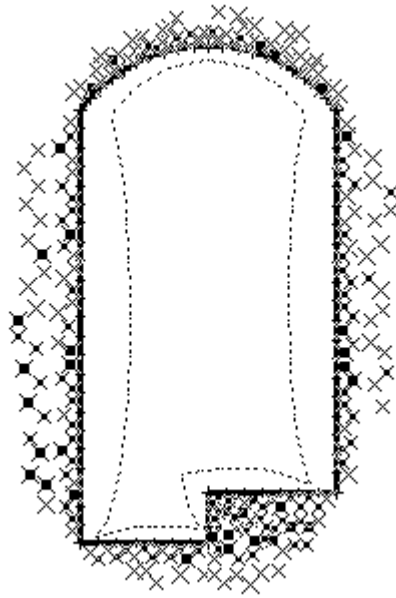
Conventional arched roof cavern shape showing zones of failure at a depth below surface of 280 m with a horizontal stress of 1.5 times the vertical stress. The deformed excavation shape is shown and maximum sidewall displacement is 38.5 mm. Analysed using PHASE<sup>2</sup>.
